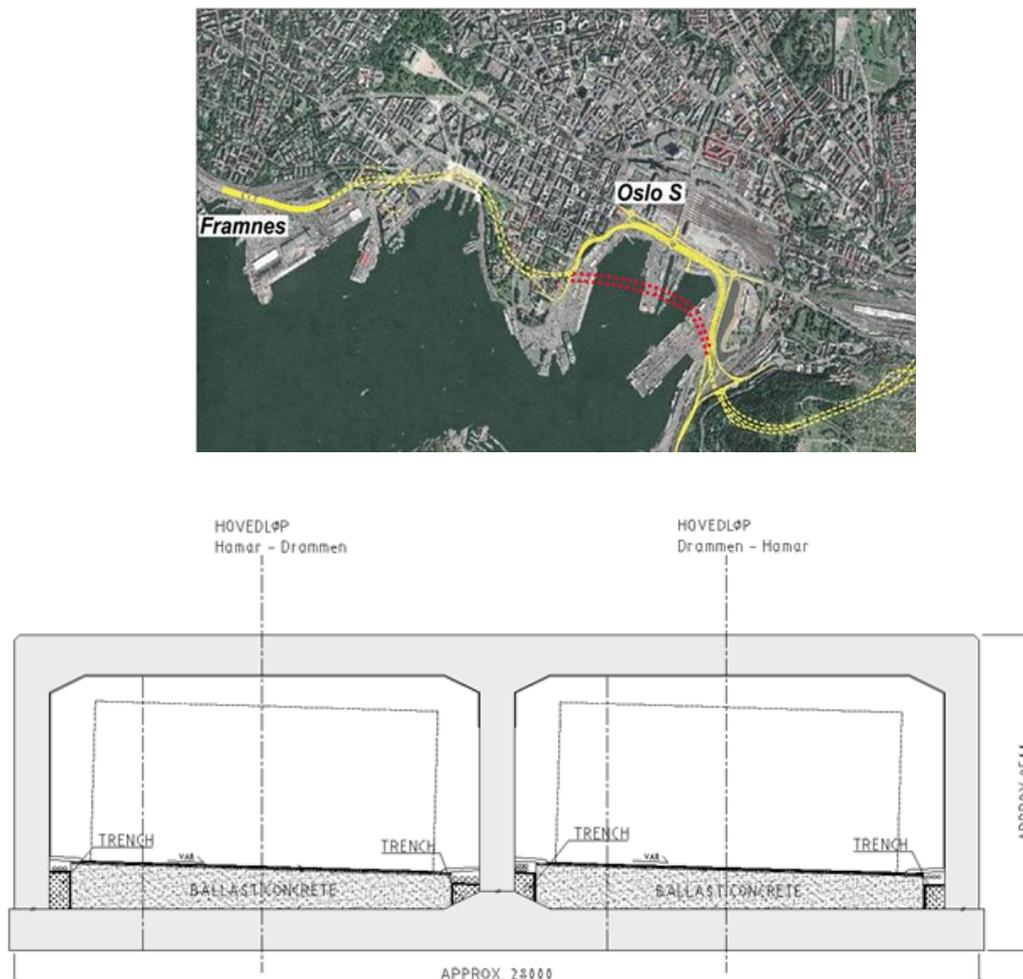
Upper figure: Location of the Bjørvika submerged tunnel project in Oslo (dotted lines over sea). Lower figure: Typical cross-section of the concrete culvert.[5]
